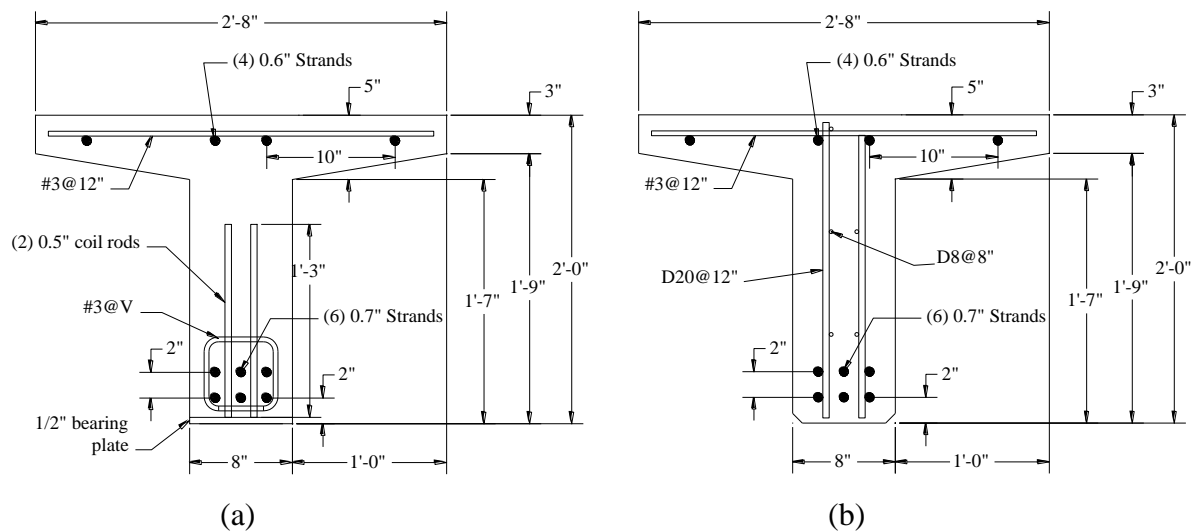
(a) Specimen End-span Section; (b) Specimen Mid-span Section
